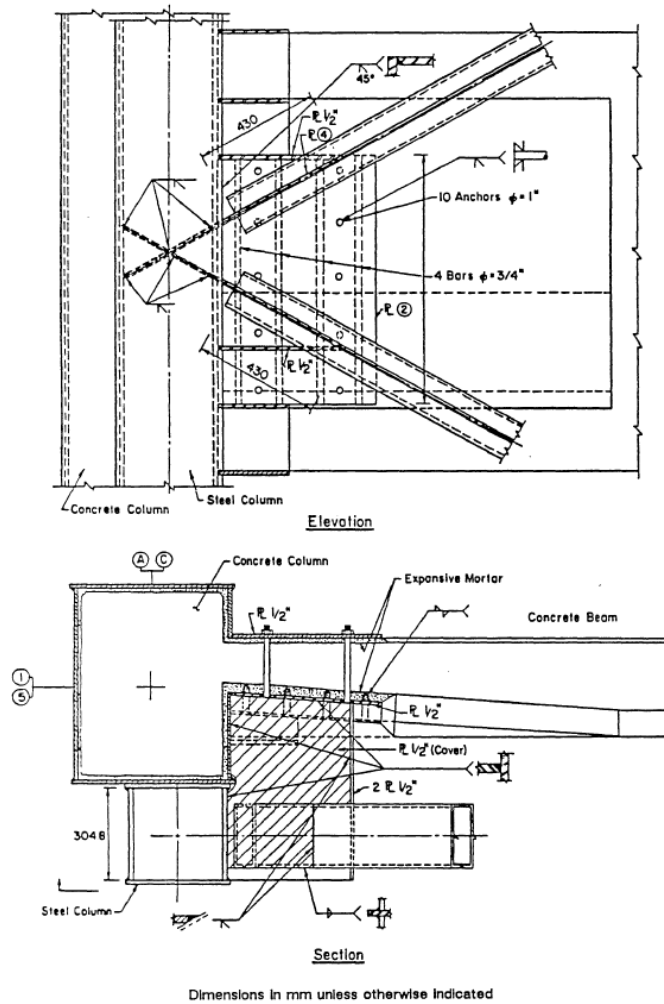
Typical detail for attachment of new steel frame to existing concrete frame (Downs, et al., 1991) alongside a view of the connection
